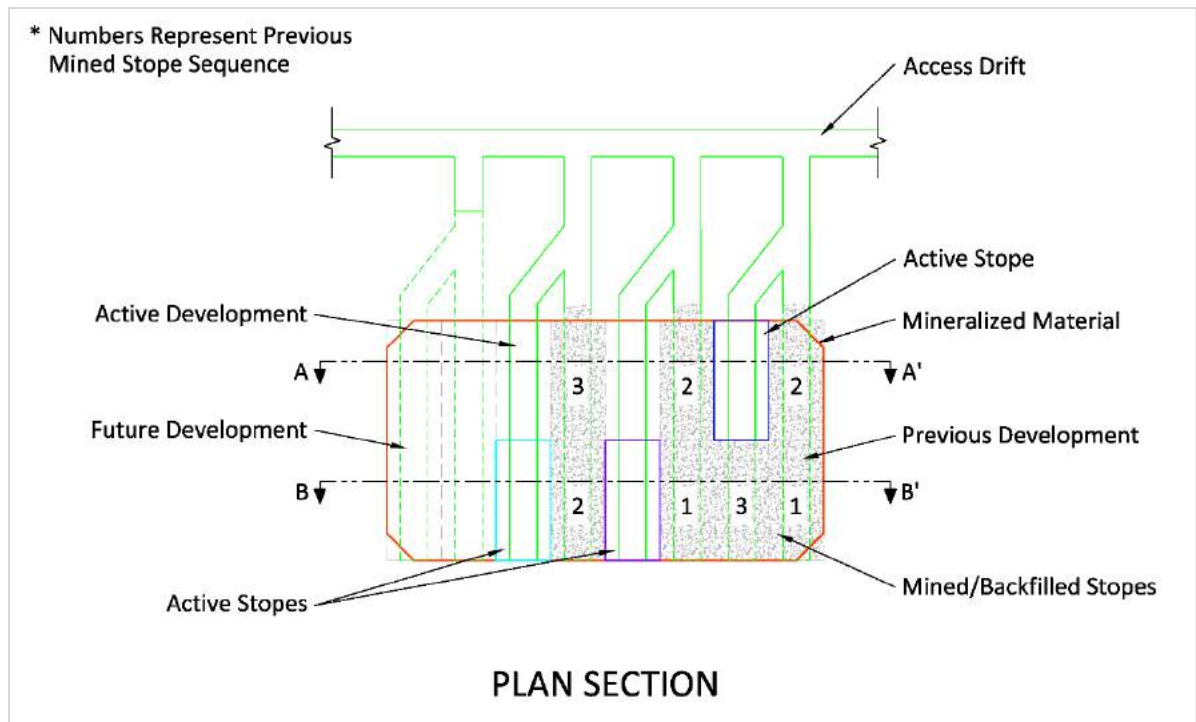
Transverse primary/secondary LHOS mining method plan section
